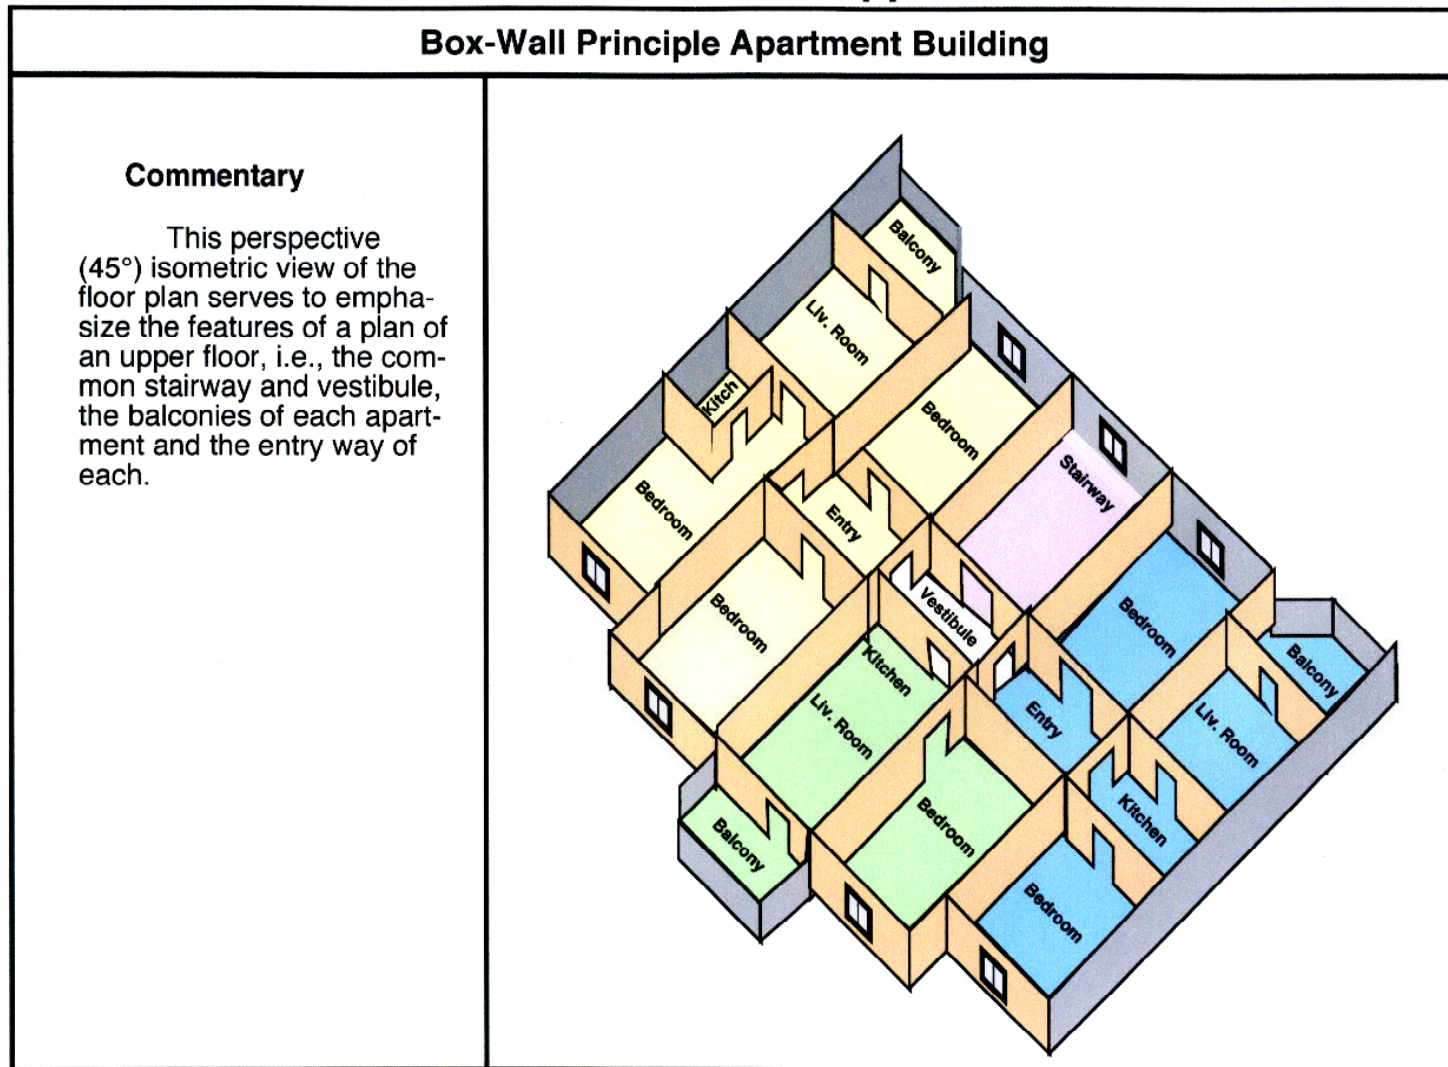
Mass 22-3-d isometric floor plan, an upper floor.
